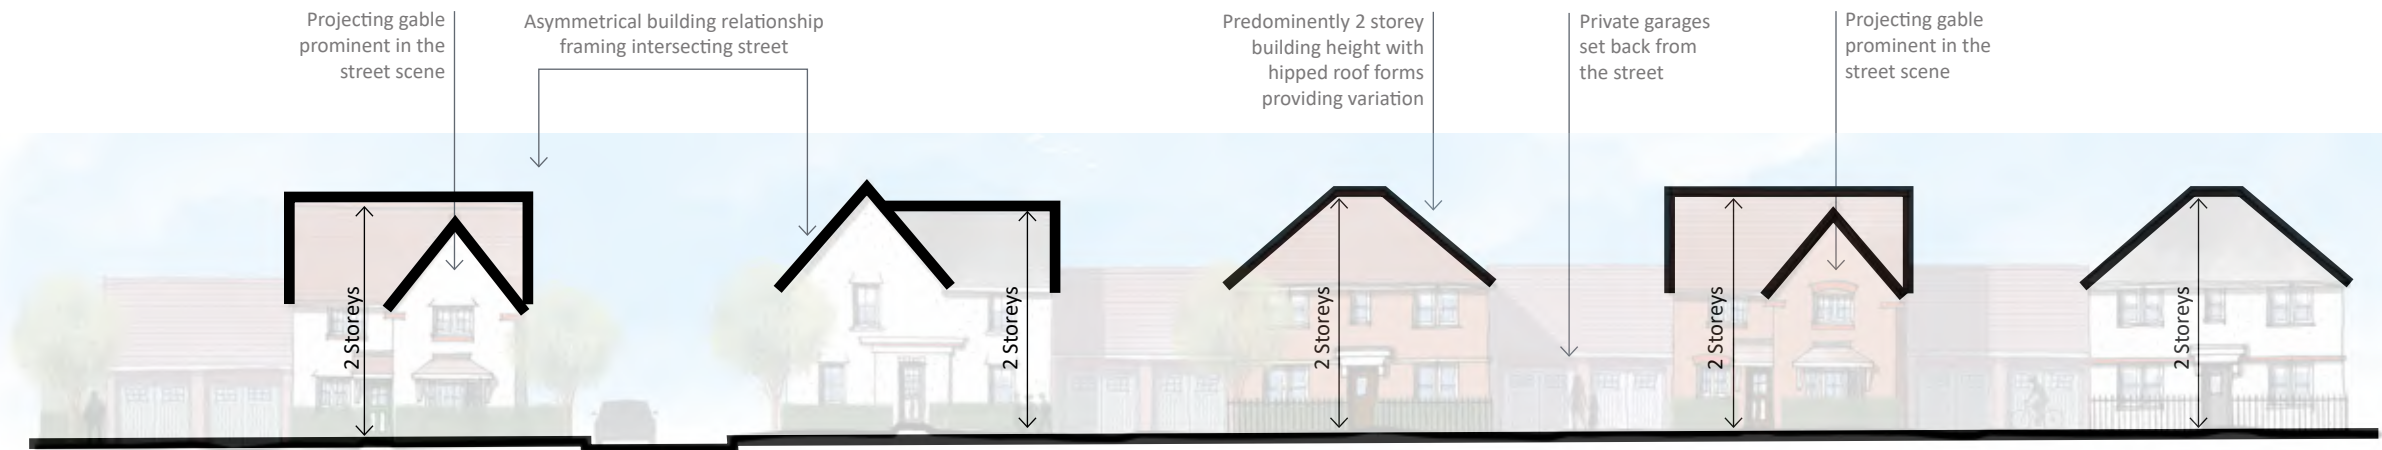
'COOL' STREET ELEVATION PRINCIPLES
